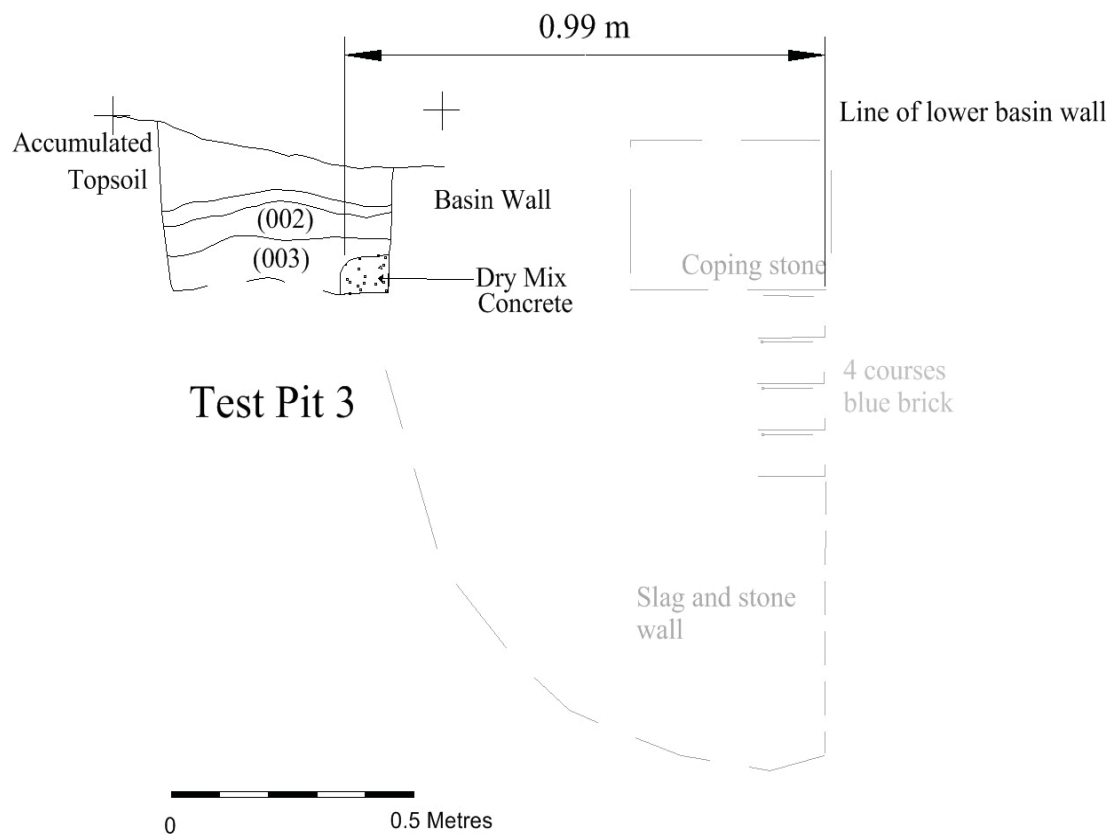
North West Facing Section of Test Pit 3 (in black observed, in grey postulated)
